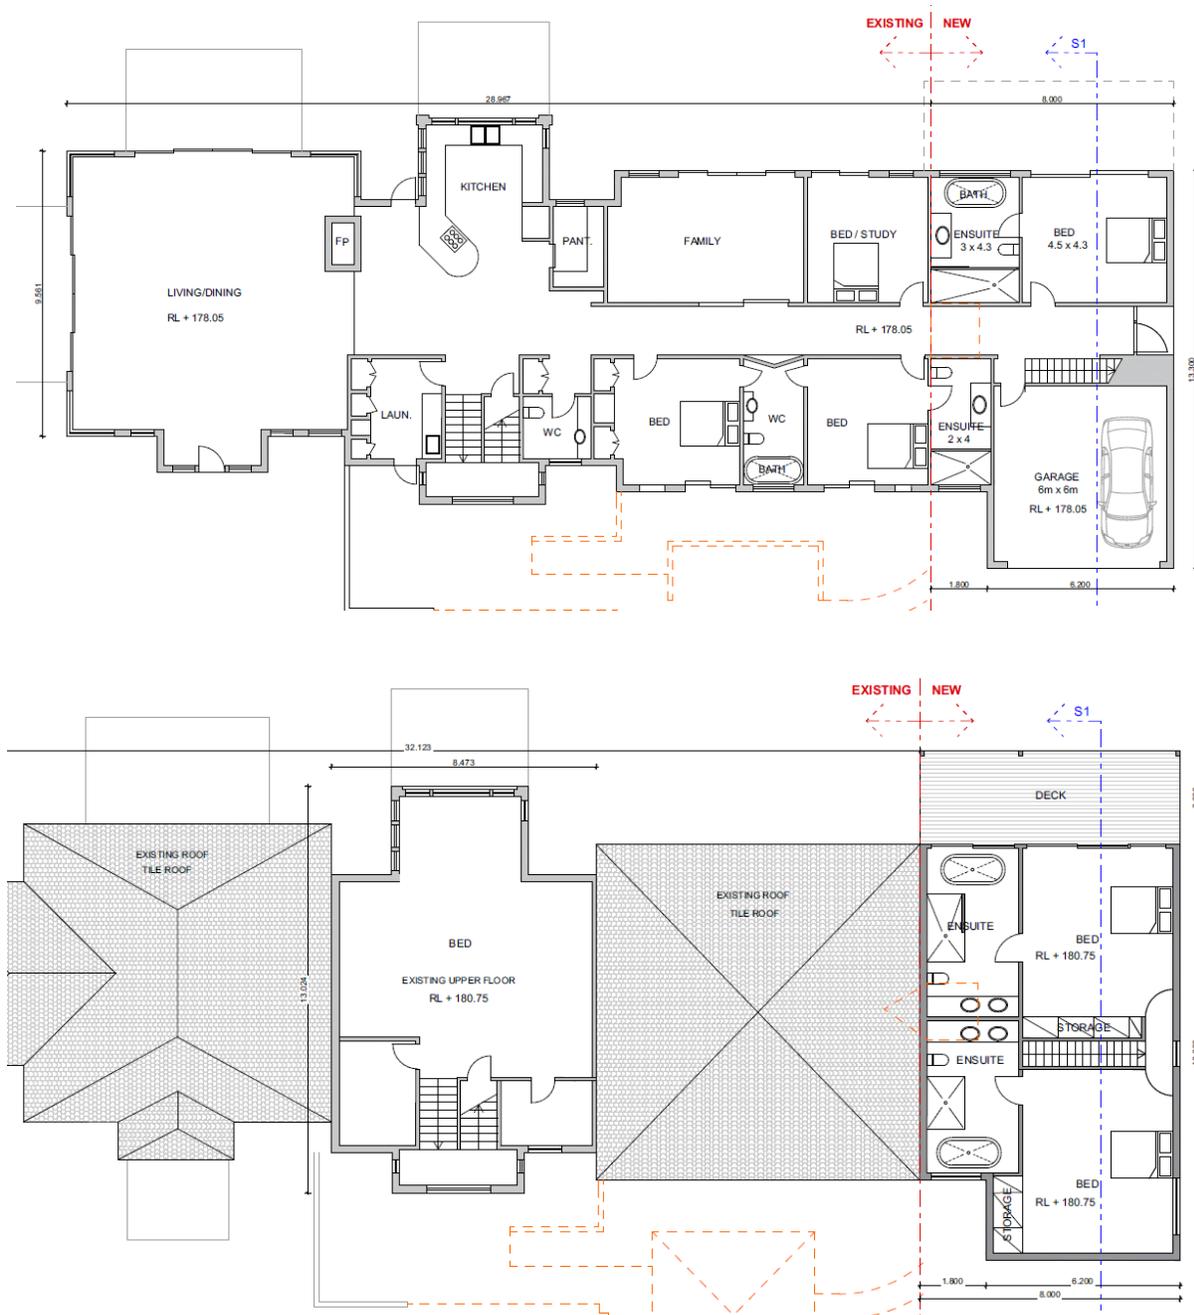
Lower and upper floor plans (source: Drew Heath Architect Associates)
